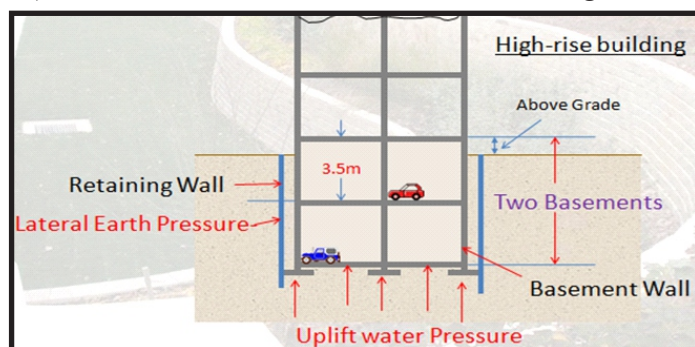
Shows forces acting on Retaining wall/Basement wall and foundation
